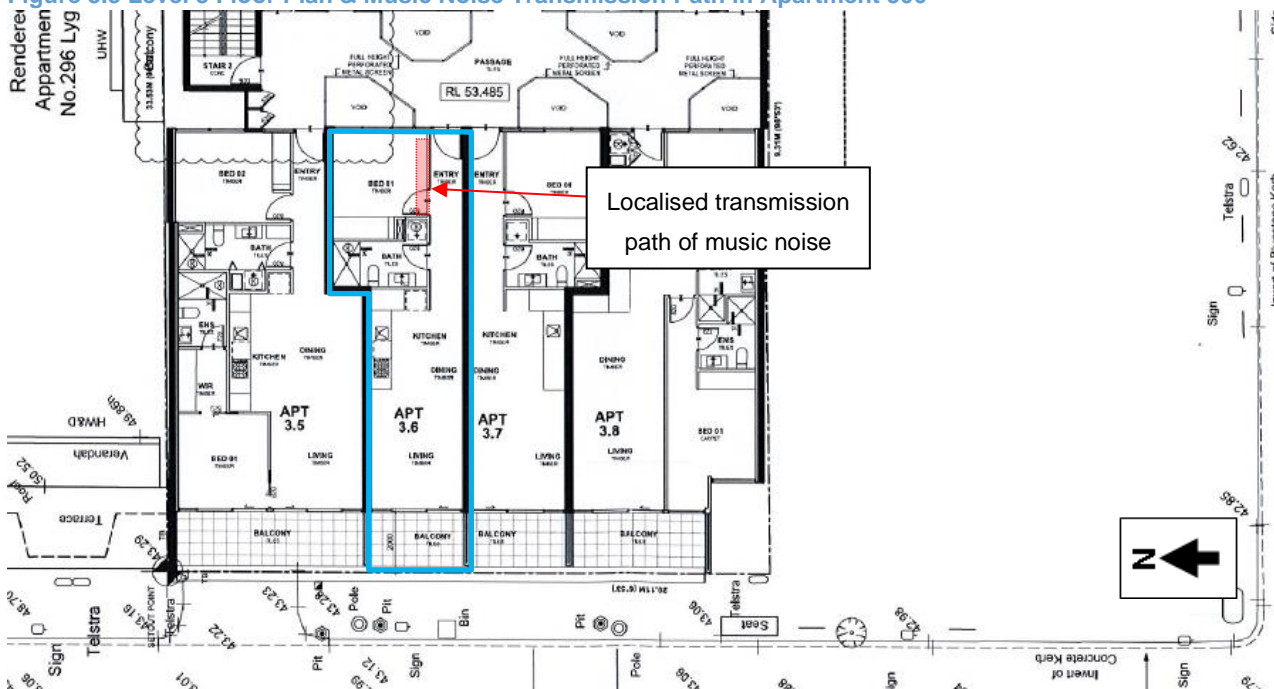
Level 3 Floor Plan & Music Noise Transmission Path in Apartment 306
